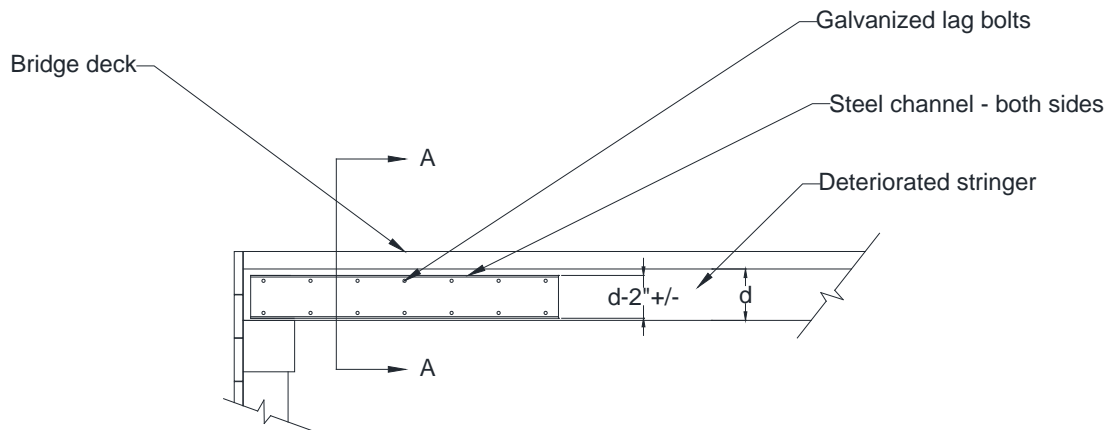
Strengthening of timber girder or stringer – shear reinforcement
